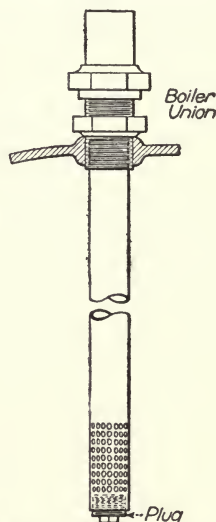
Boiler Tube Which Will Not Stir Up the Sediment.
